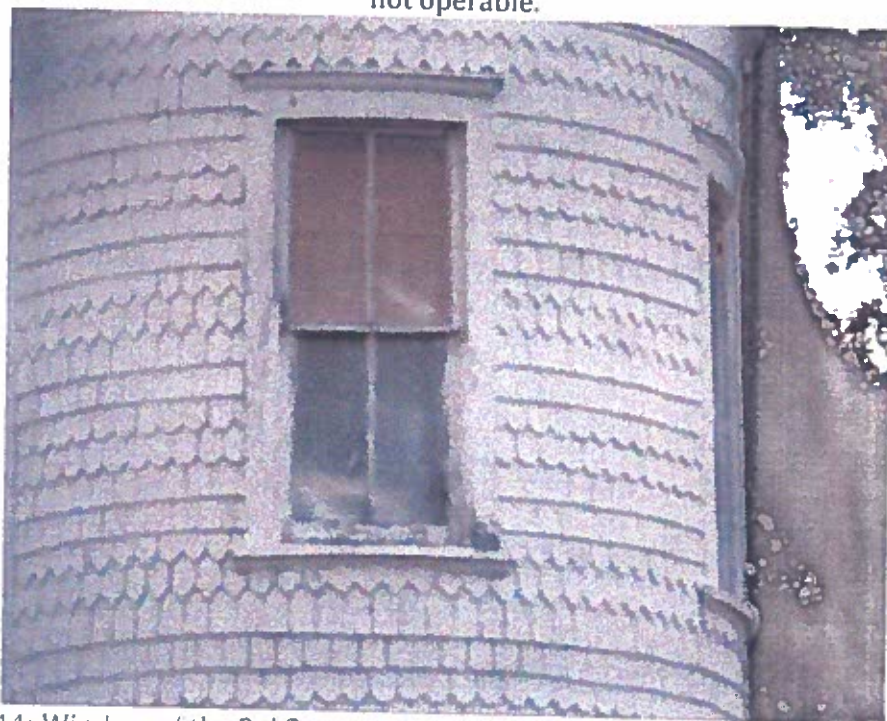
Window of the 2<sup>nd</sup> floor turret facing east. Panes are broken and window is paint shut. May not operate.
